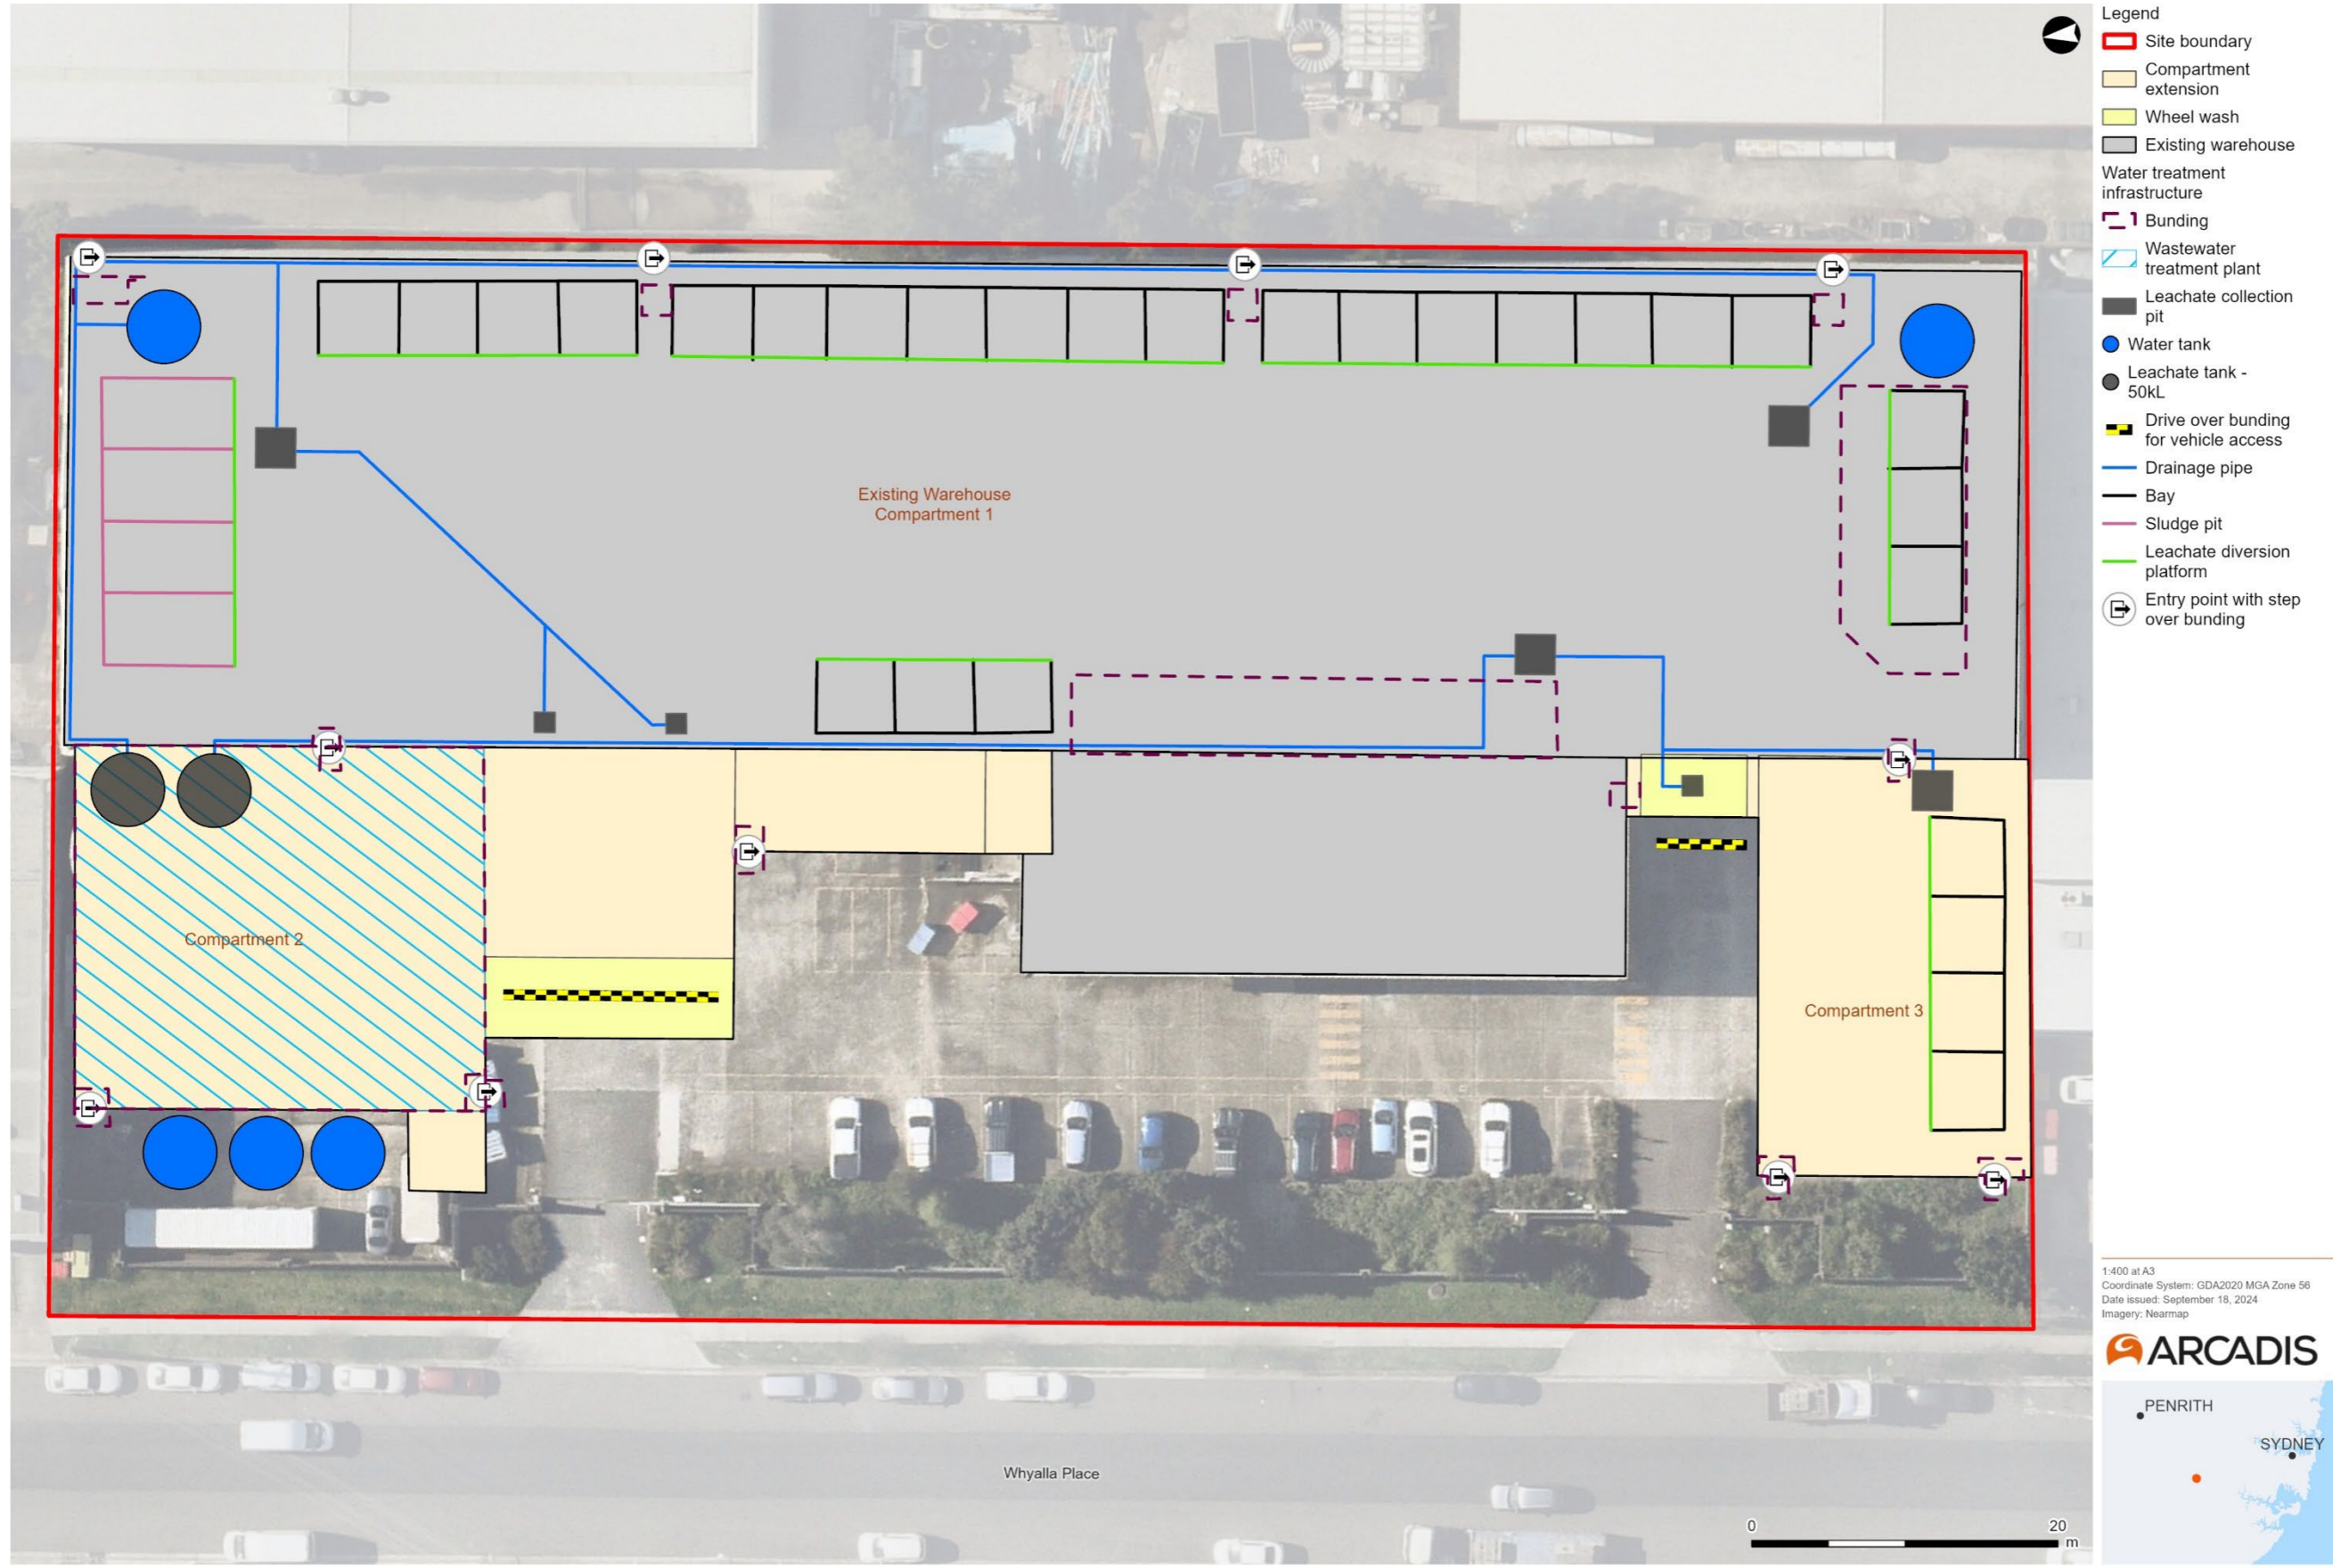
Conceptual site bunding and leachate treatment infrastructure
